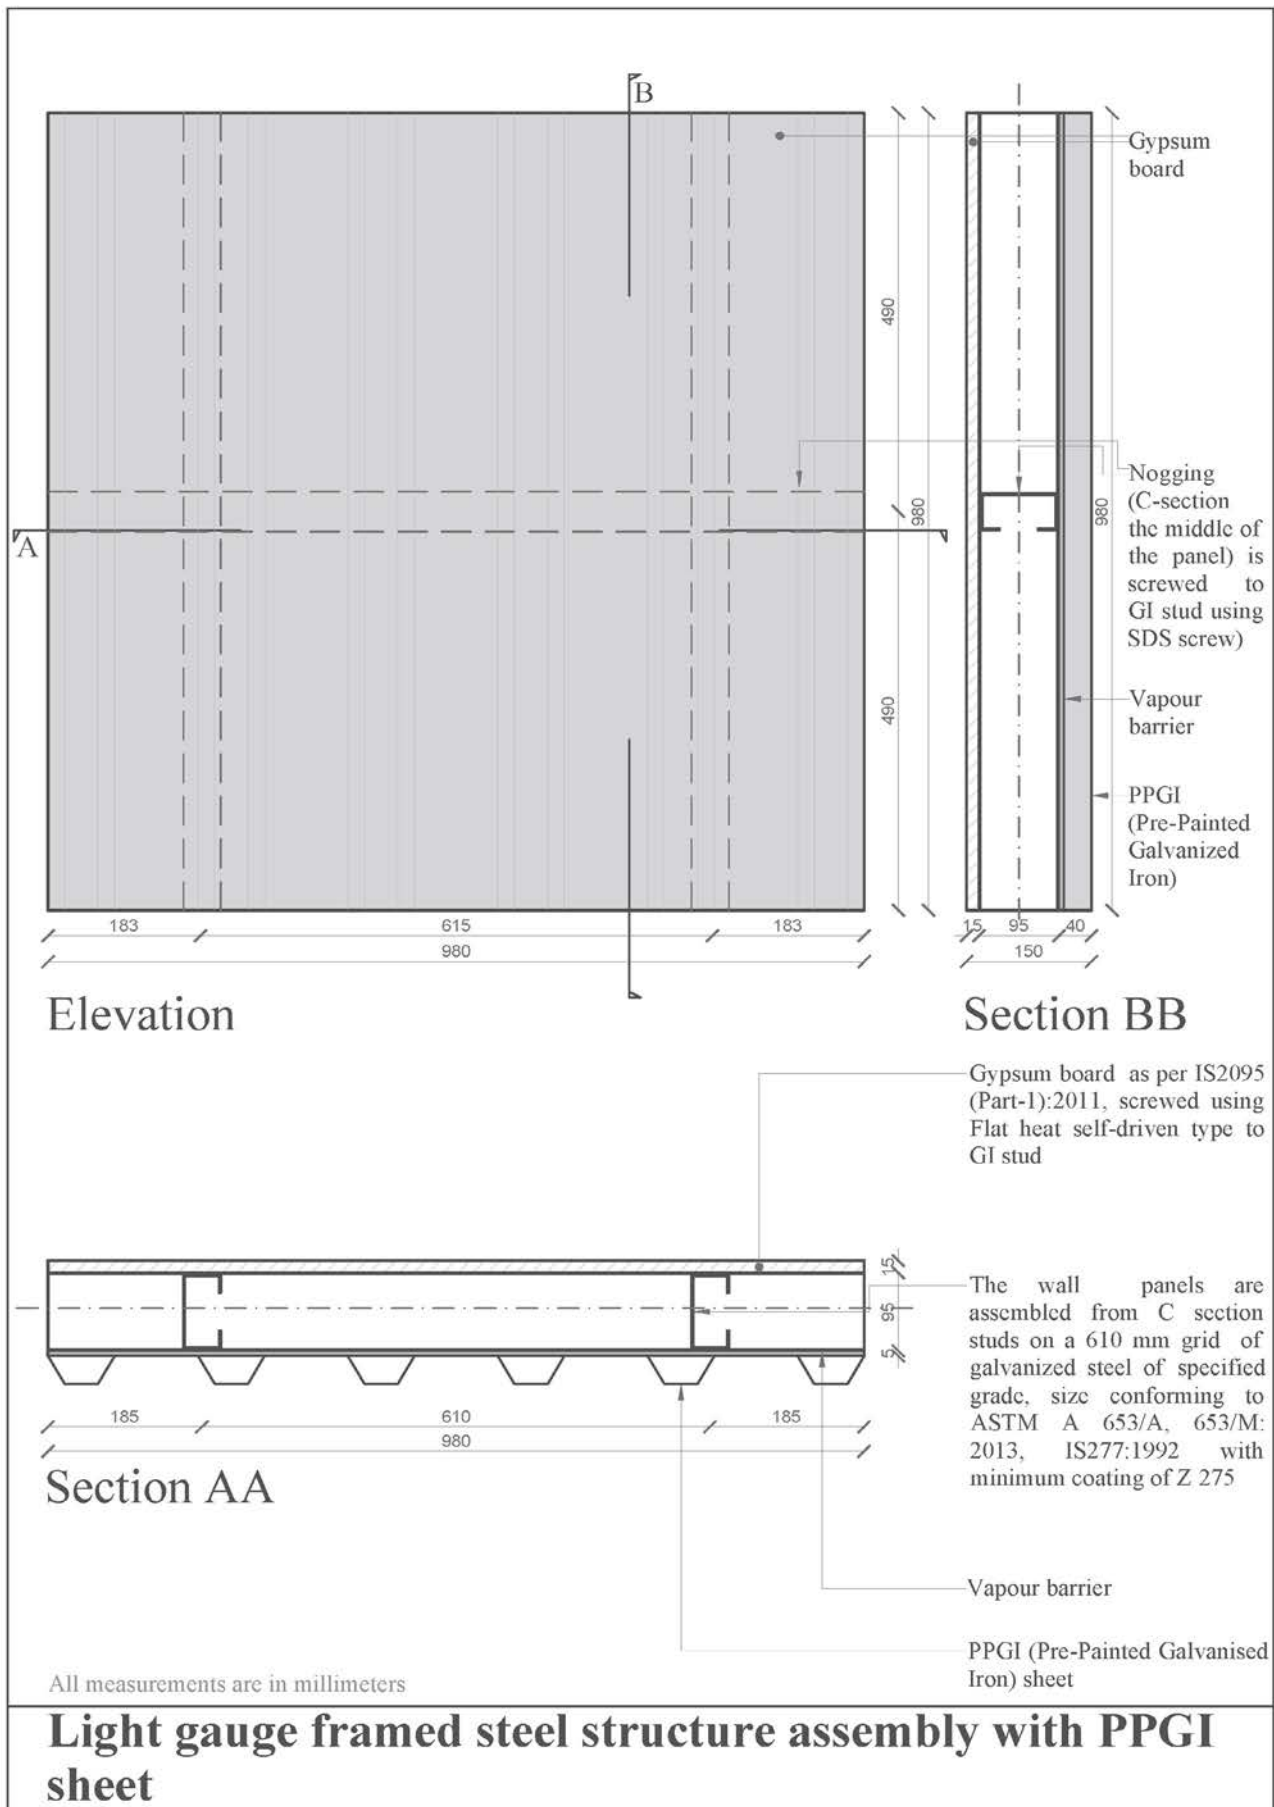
Schematic drawings of light gauge framed steel structure wall sample with PPGI sheet as per specifications and drawings found in BMTPC Performance appraisal certificate (PAC) no: 1014-S/2014.
